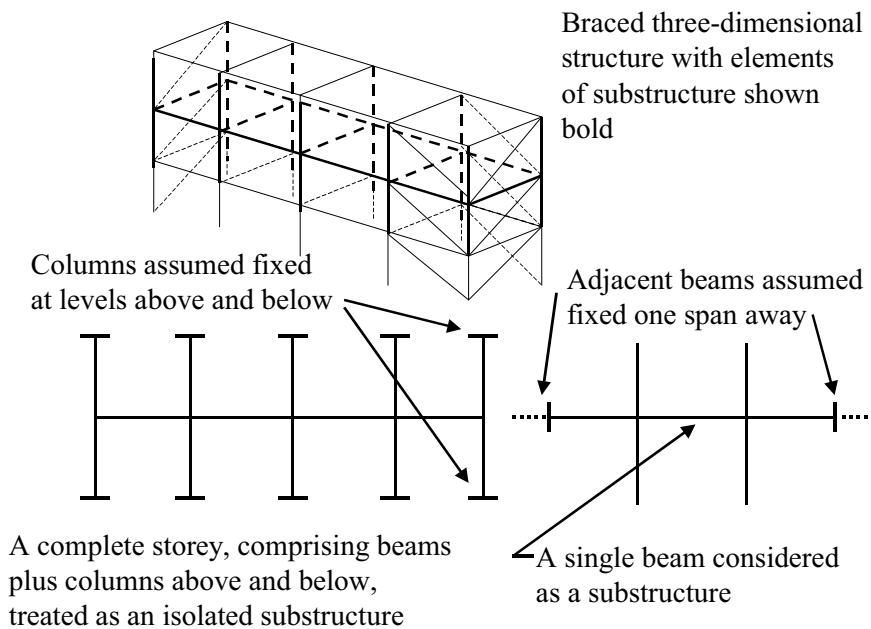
(b) *Assumptions for Individual Levels of Multi-Storey Buildings and Floor Beams considered as Substructures
